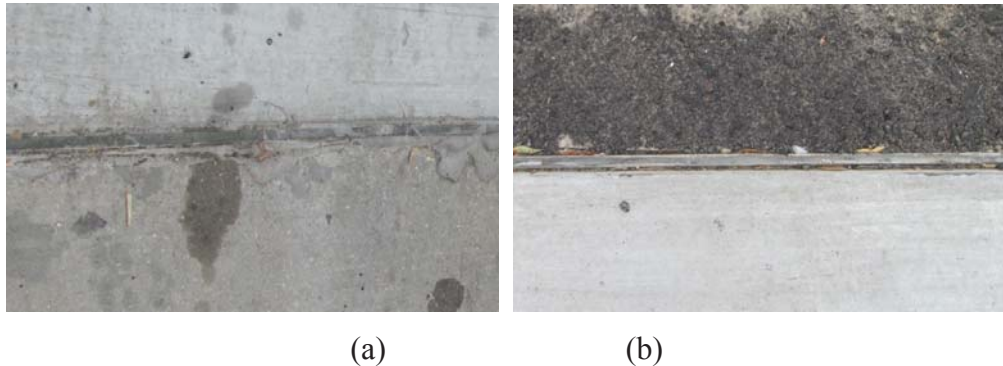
SMP slab installation: (a) slab in concrete-concrete channel, (b) slab in concrete-asphalt concrete channel.
